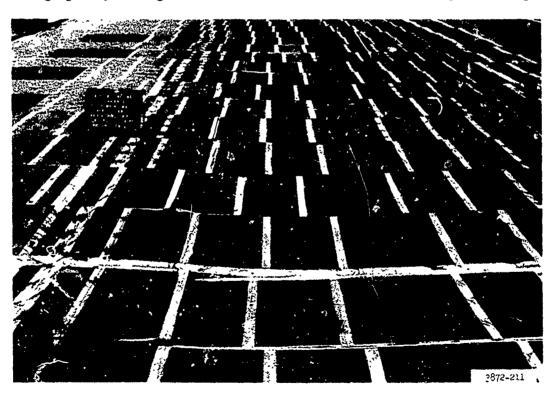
Test section II, lane 2, item 3, after failure at 144 coverages
